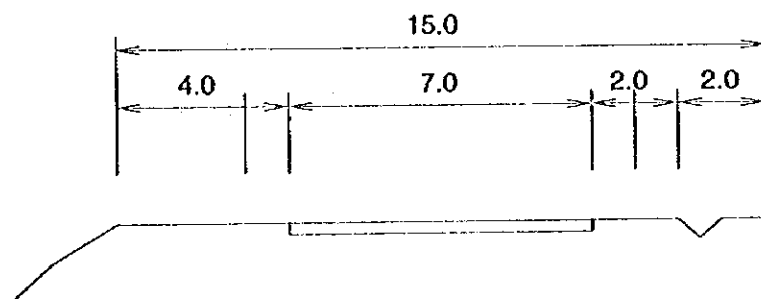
Road Section -1 (from Bejuco to Chame Center)
